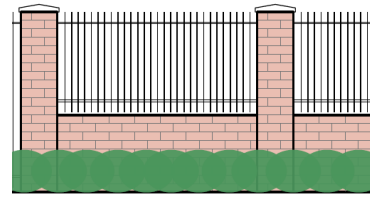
Permeable fencing – brick pier and low wall with permeable infill panel
